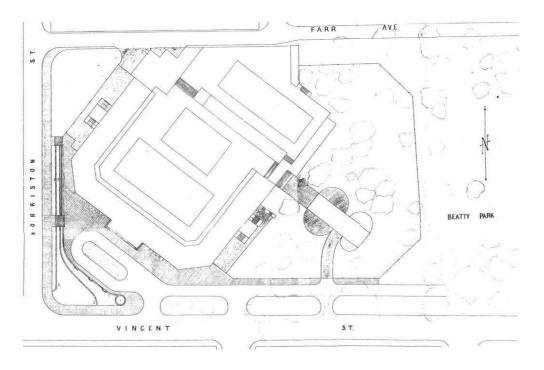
City of Perth, *Beatty Park* Swimming Centre, Site Plan, K.C.E.D., 6 August 1962, in Aquatic Centre . The plan shows changes made to the walling proposals along the Morriston Street frontage.- General- *Beatty Park*, City of Perth, SROWA AN 20/5 Acc. 3054 Item 61 (1963).
